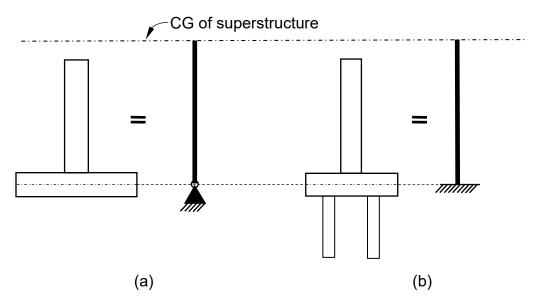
Structural Modeling of (a) Shallow Foundations and (b) Pile Groups (Superstructure is not shown)
